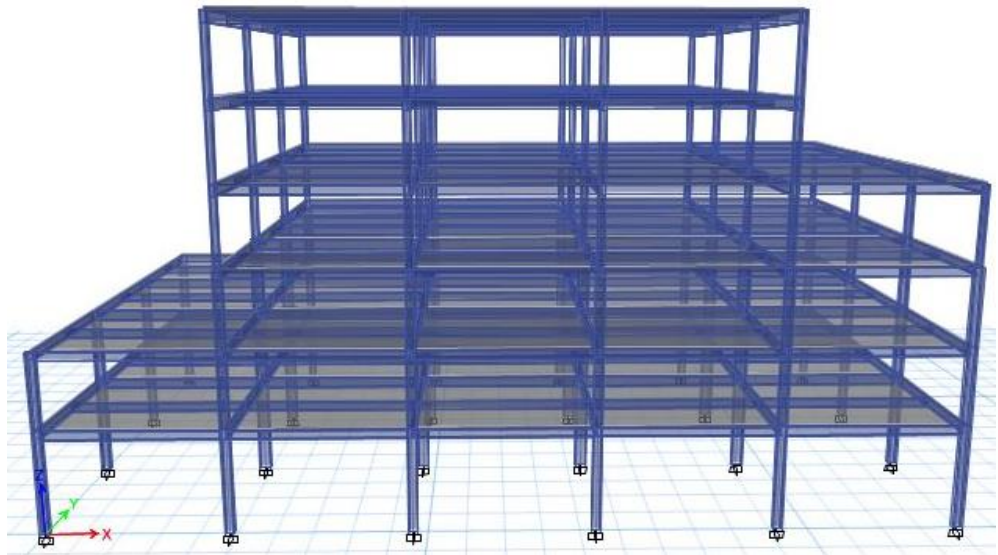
3D view of (1Rx1L) D E 6 story elevation
